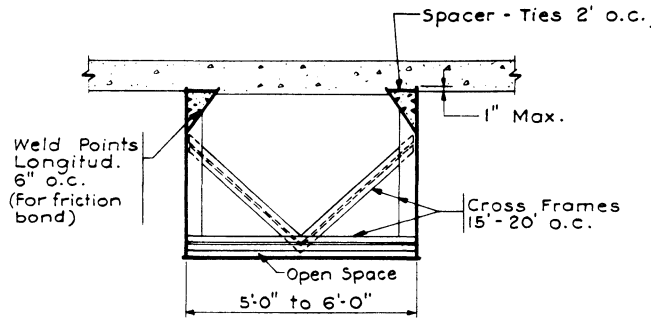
Box UV girders (Hadley). This box girder with corner plates forming continuous V-shaped troughs filled with concrete illustrates an unusual method proposed by Hadley for connecting the composite deck to the steel box
